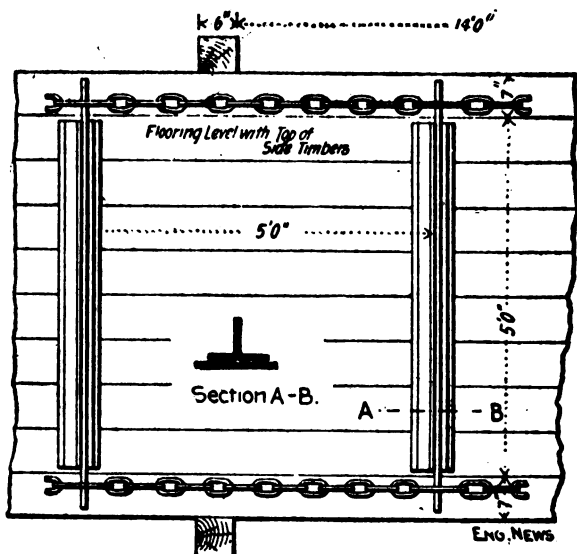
Sketch Detail of Conveyor Floor and Scrapers.
